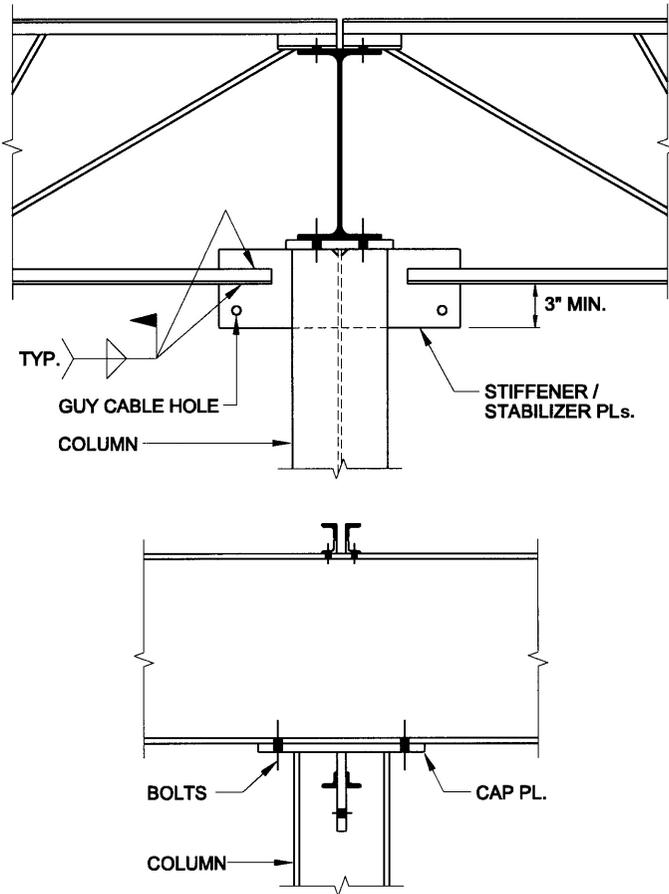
Beam framing continuously over column top, stability provided with welded joist-chord extensions at column top.
